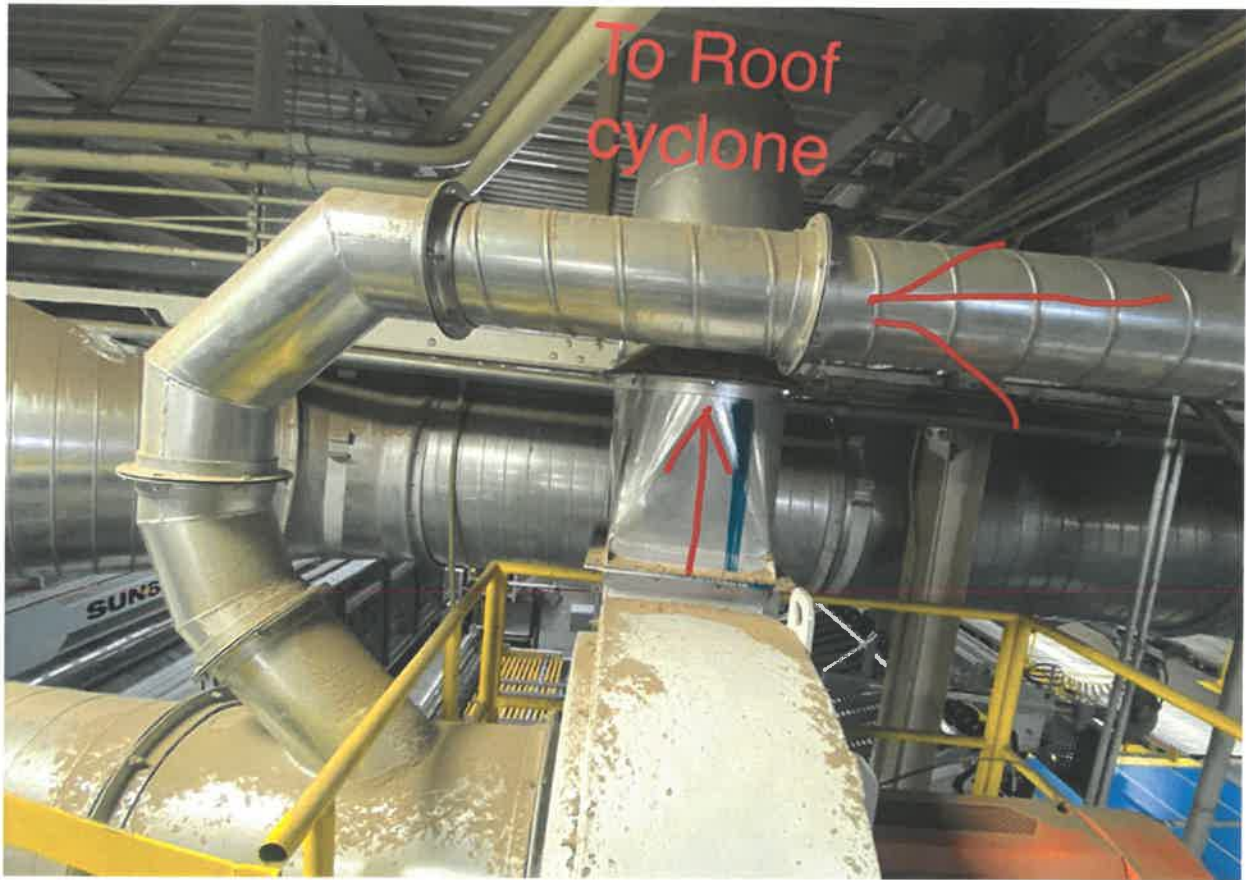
RDC scrap ducting connection with Twin Handling Cyclones fines exhaust to CBP #45 then to existing cyclone on the roof
